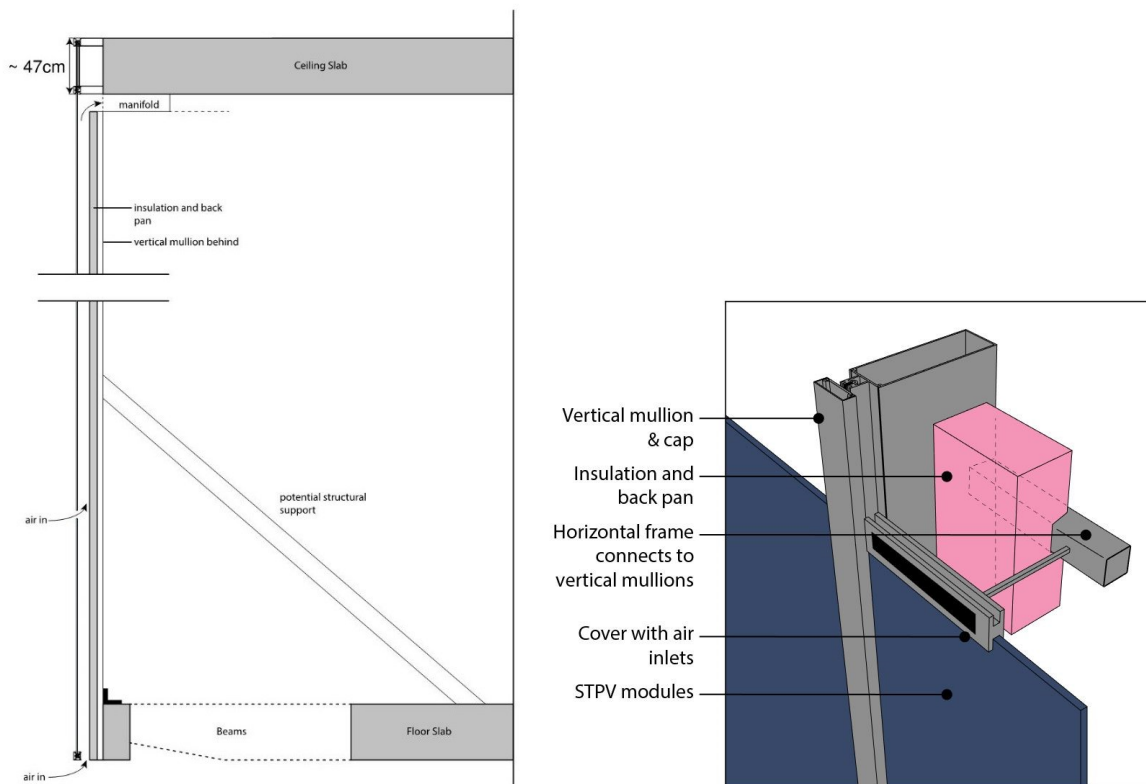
Structural attachment of the BIPV/T system (left) and horizontal tie-backs at inlet framing (right)
